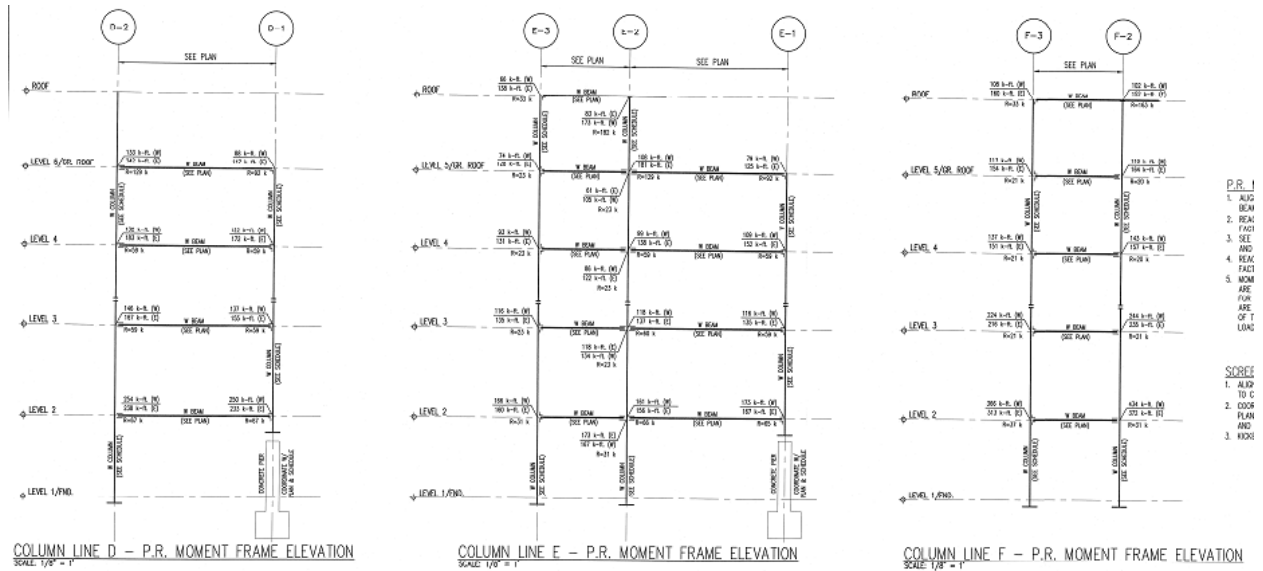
P.R. Moment Frame Elevations (D, E, and F)
